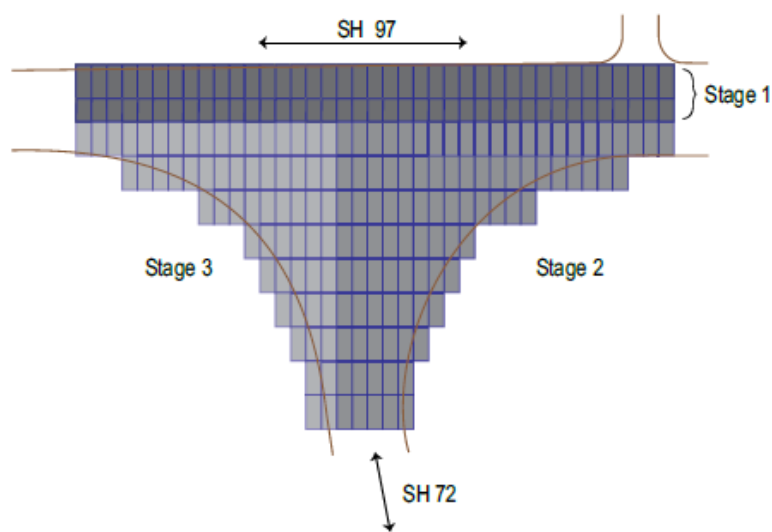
Precast panel layout and installation stages for the SH 97 and SH 72 HMA pavement intersection rehabilitation project, Fowlerton, TX
